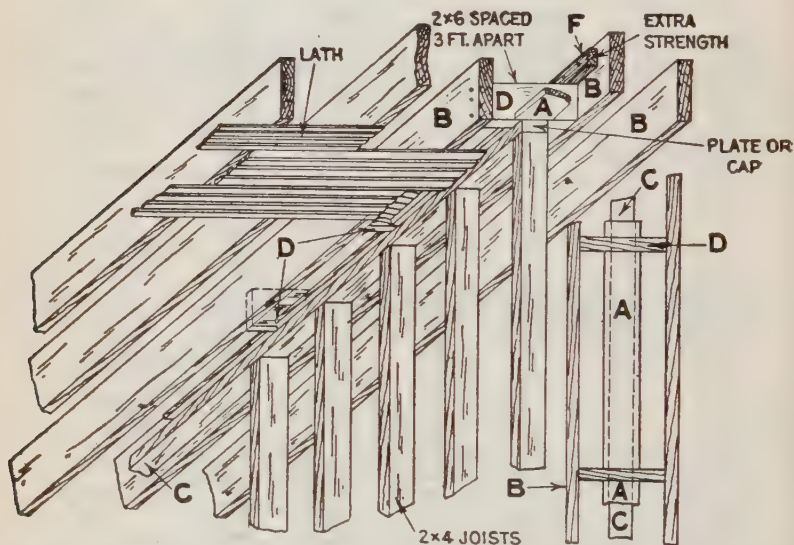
,894.—Partition running parallel and between joists showing bridges for plate, bracing, and nailing strip for laths.
